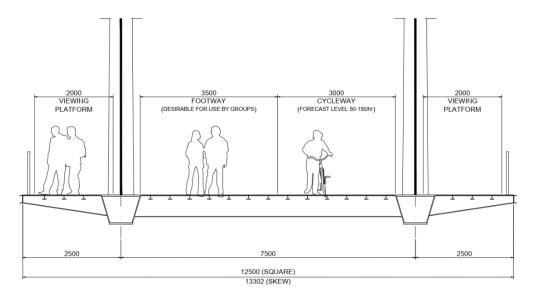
Option 2 cable-stayed bridge cross section.
